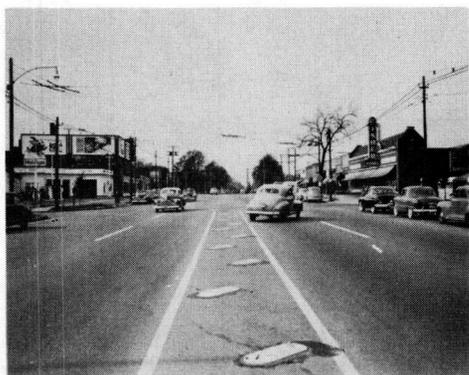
Double Rows of Precast Concrete Traffic Dividers in Urban Sections
